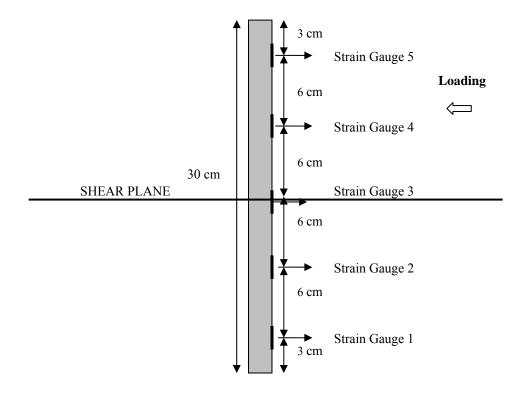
Typical Model Pile and Strain Gauge Installation
